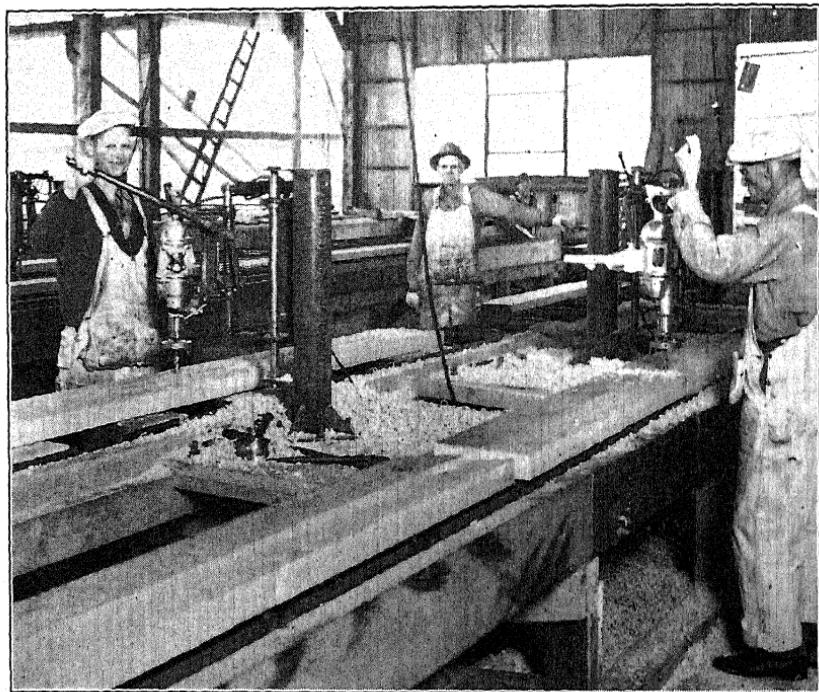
Fabricating truss members in shop of Timber Structures, Inc., Portland, Oregon.
